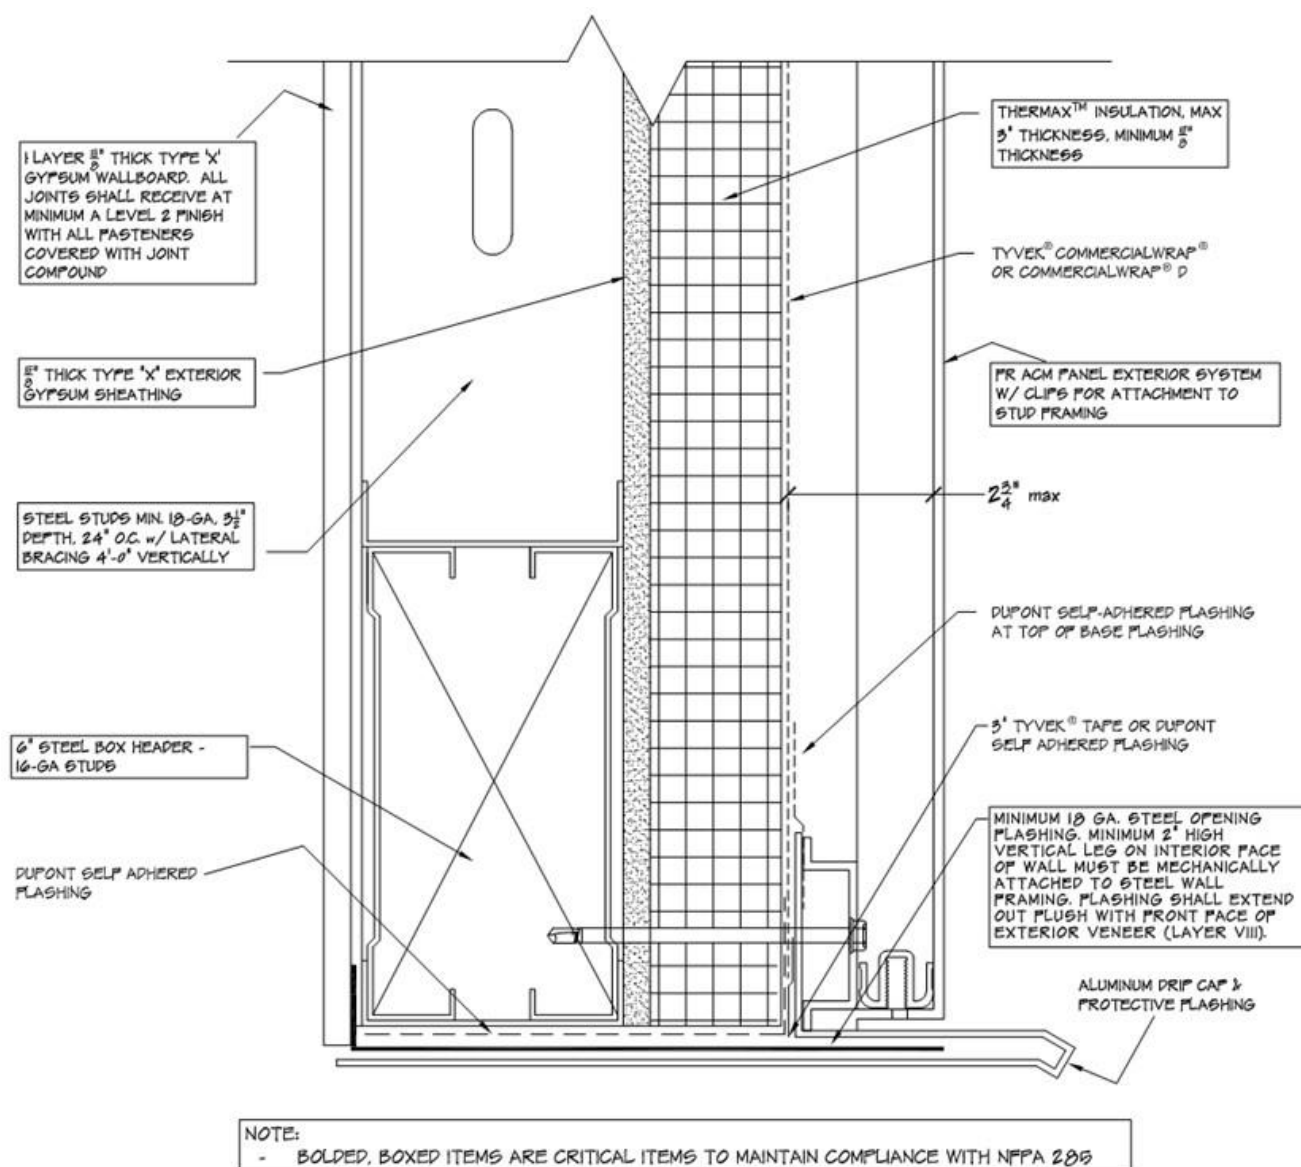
Required Opening Head Protection When Spray Foam Is Used in the Cavity (Infill Wall Construction with ACM Façade)
